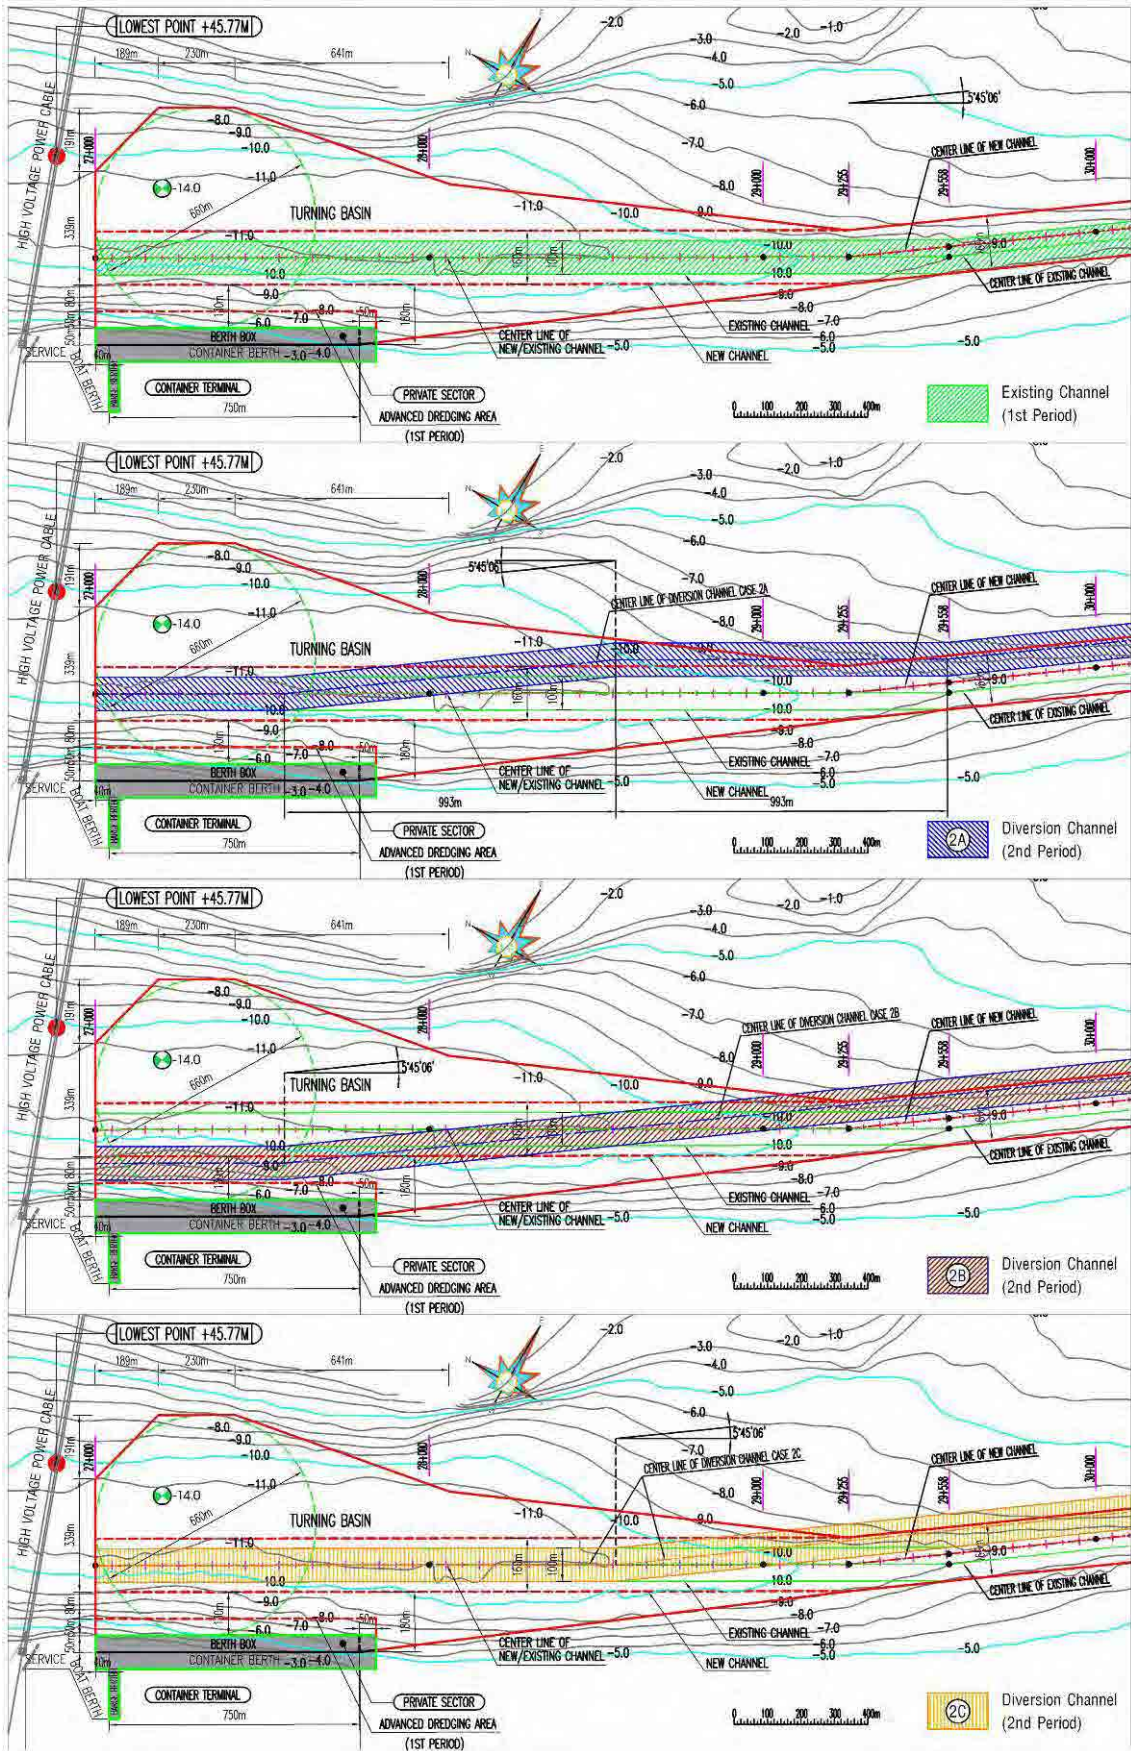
Sample of Channel Diversion Plan for avoiding High Voltage Cables
